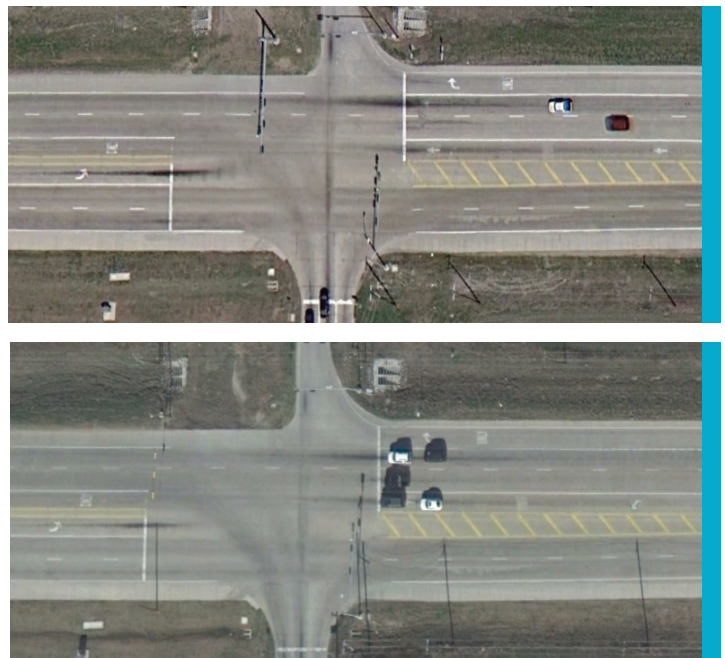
Before (top, 2009) and After (bottom, 2010) Pavement Marking Modifications at U.S. 380 and Dallas Parkway (Image: Google)
